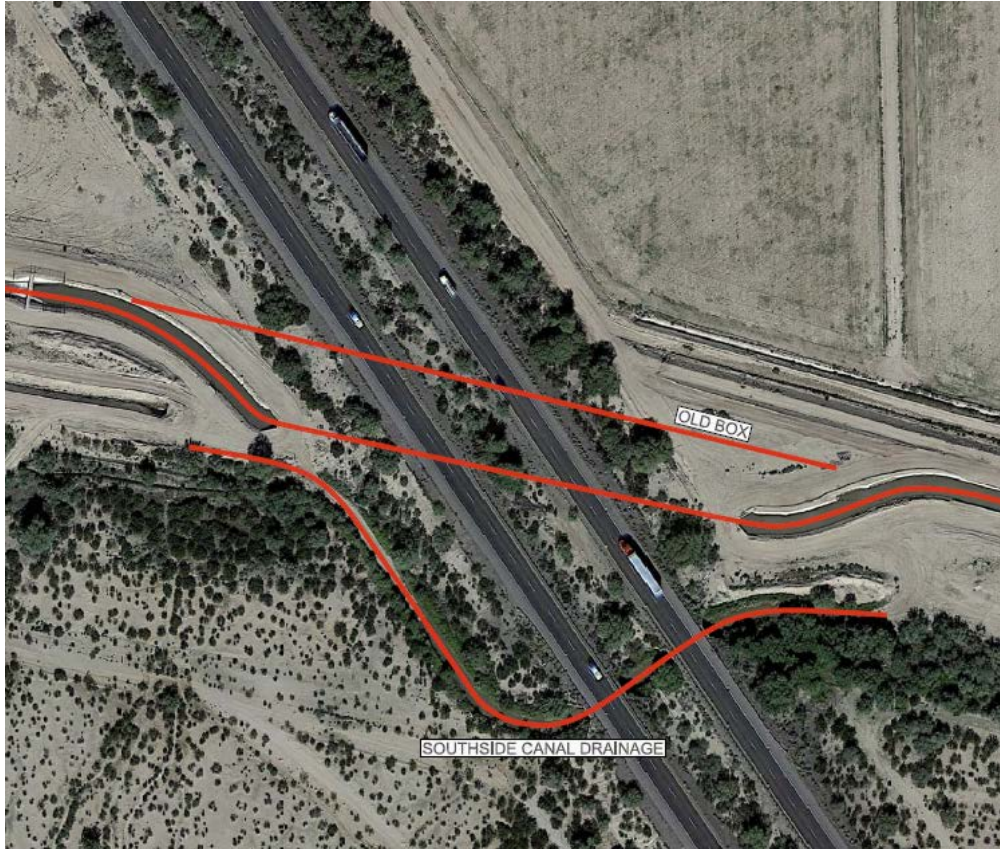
Southside Canal unused and current box culvert and drainage channel under I-10.
